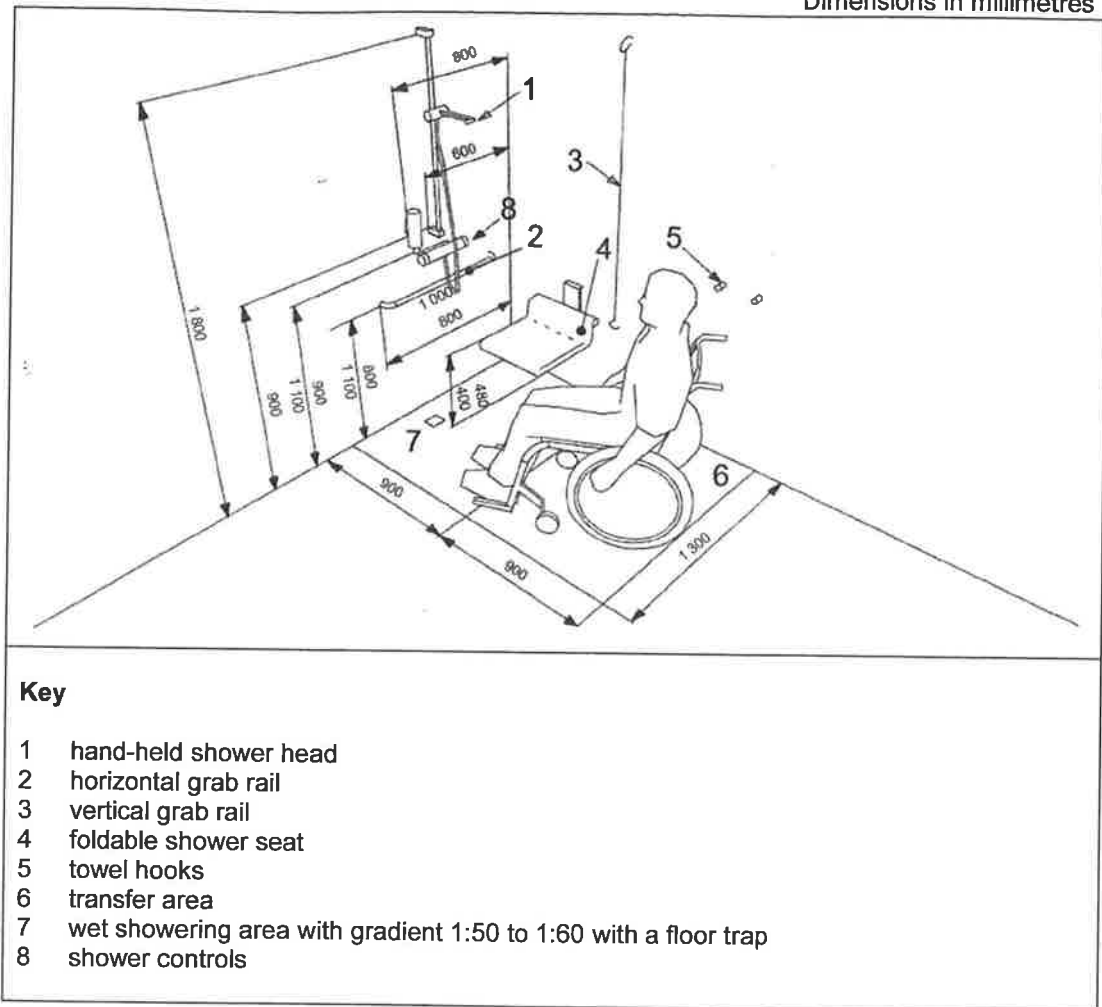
Example of a shower place with grab rails, adjustable shower head and folding seat
